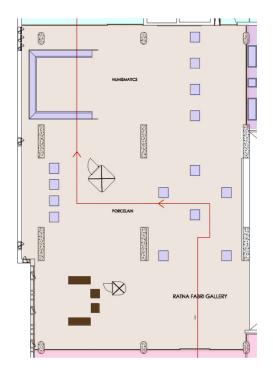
Proposed plan of Ratna Fabri Gallery on the First floor of the Museum
